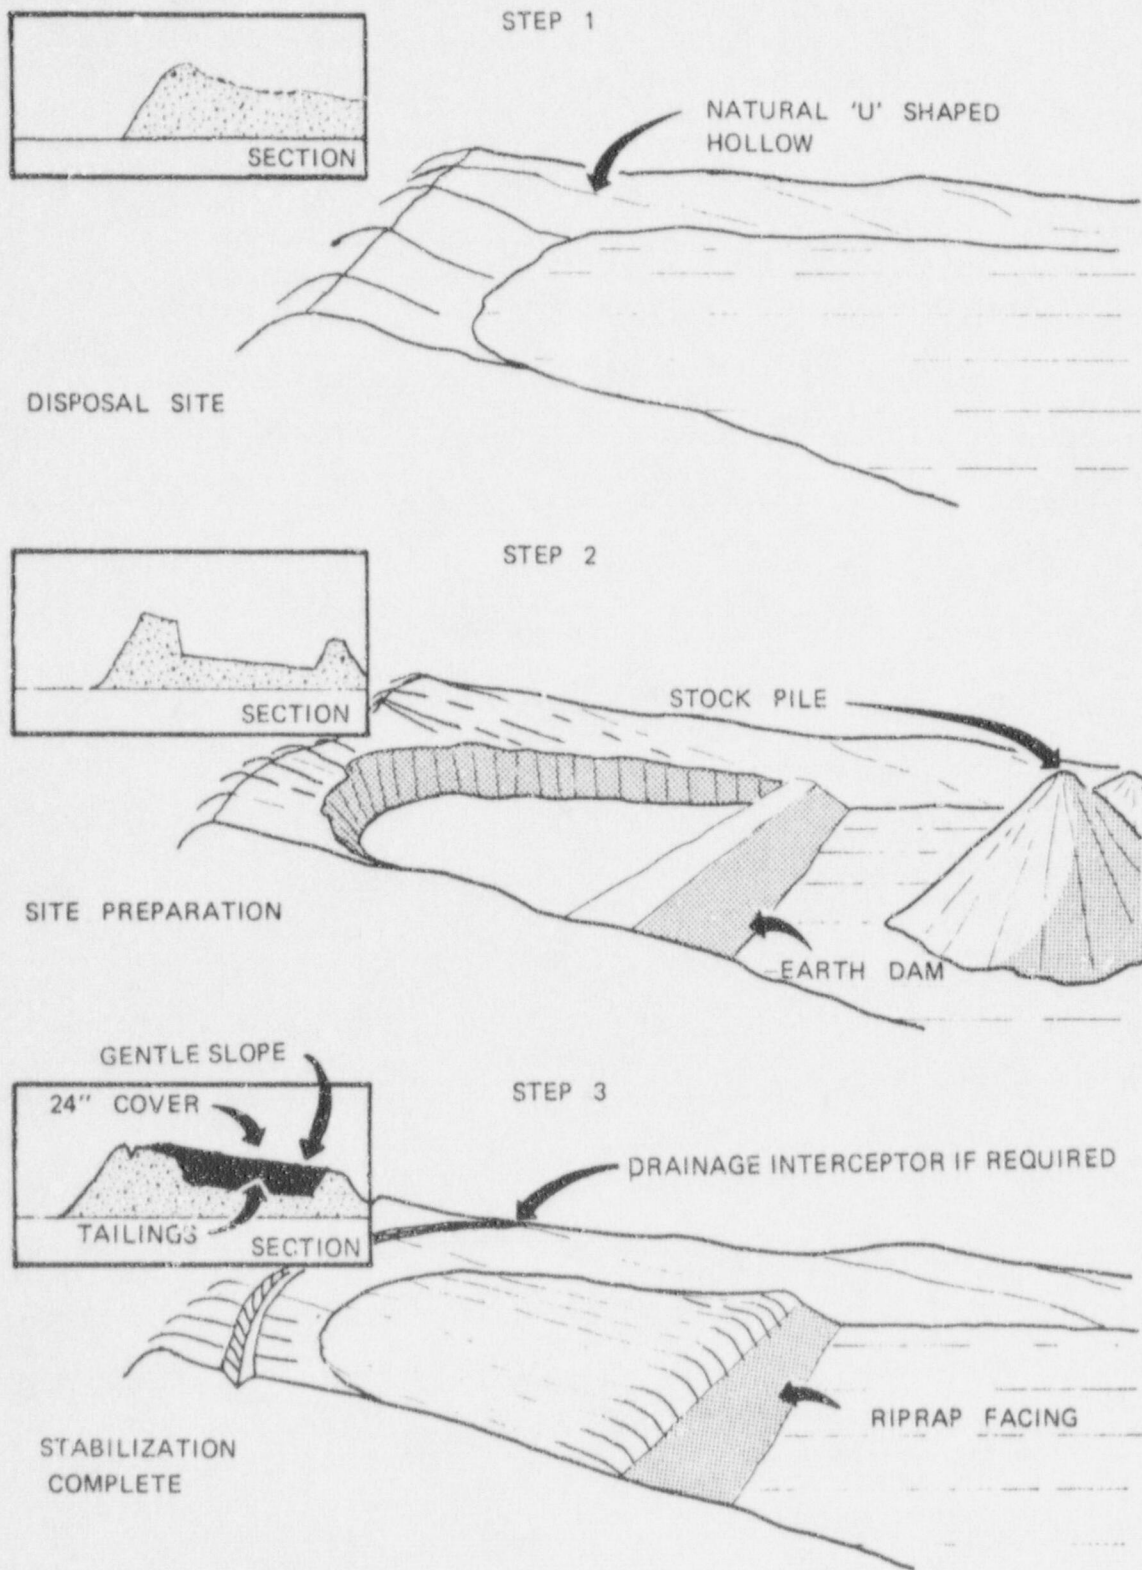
SCHEMATIC OF TYPICAL LONG-TERM TAILINGS STORAGE SITE
